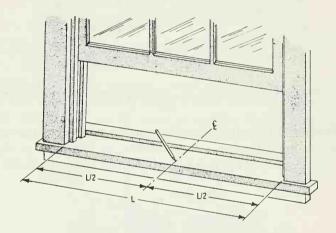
The method of measuring the window sill to establish the mounting position of the air conditioner.
